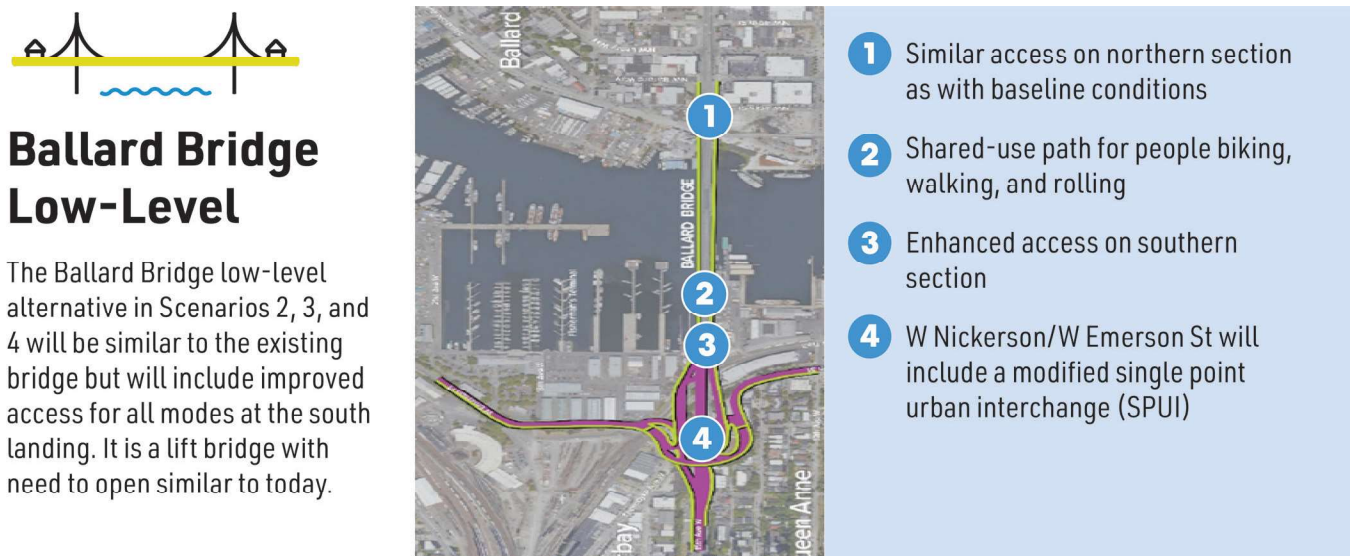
LOW-LEVEL BALLARD BRIDGE ALTERNATIVE
